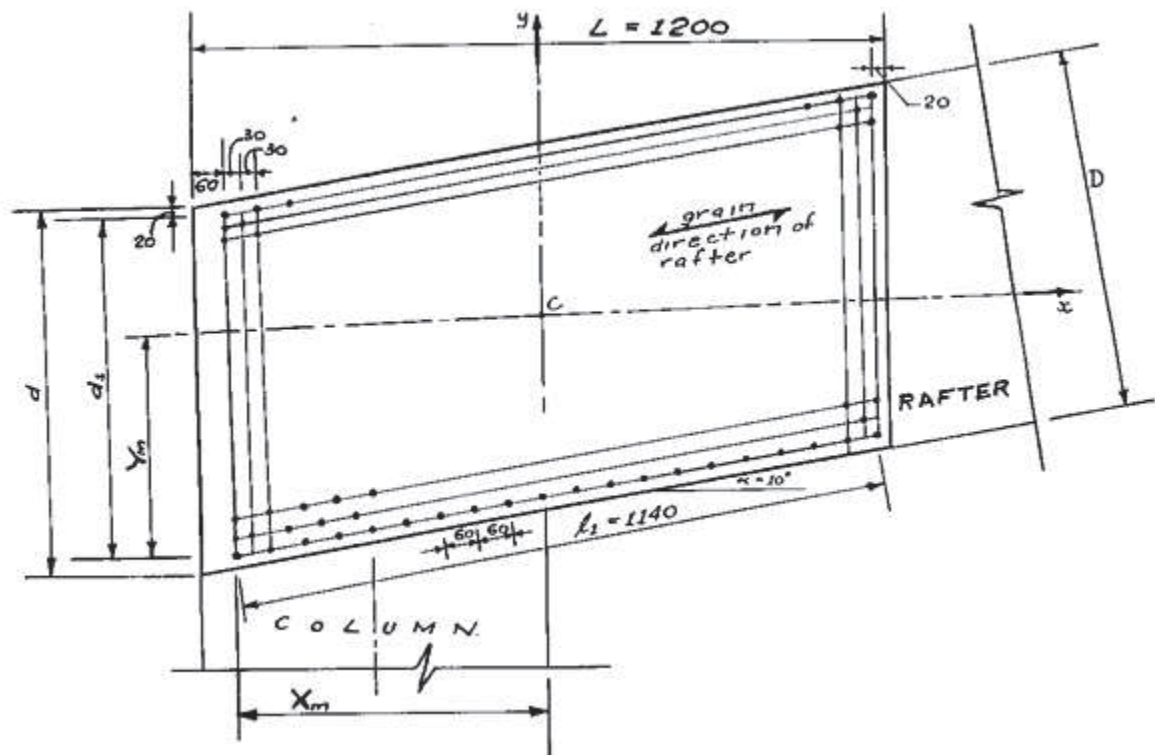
Shows nailing pattern for nail group in column or rafter
